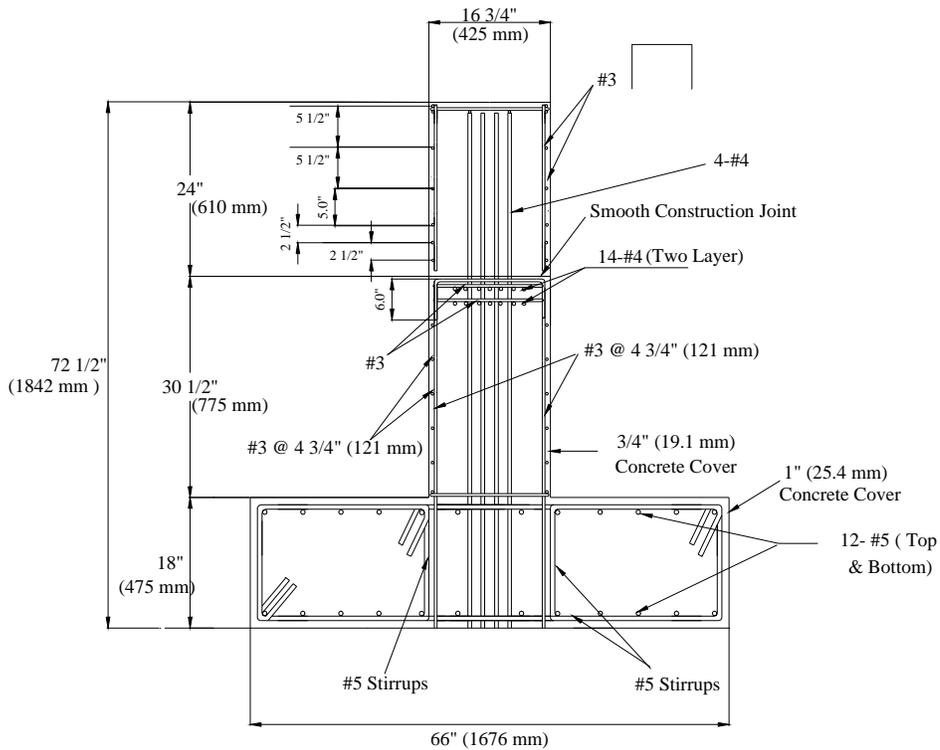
7- Reinforcement Layout (Section B-B)-Test Series V
